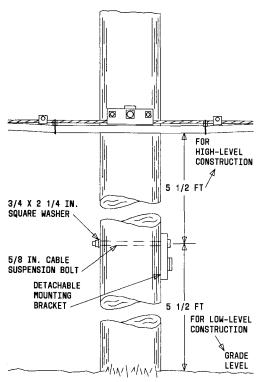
Bolt Detachable Mounting Bracket to Pole or Stub Pole
